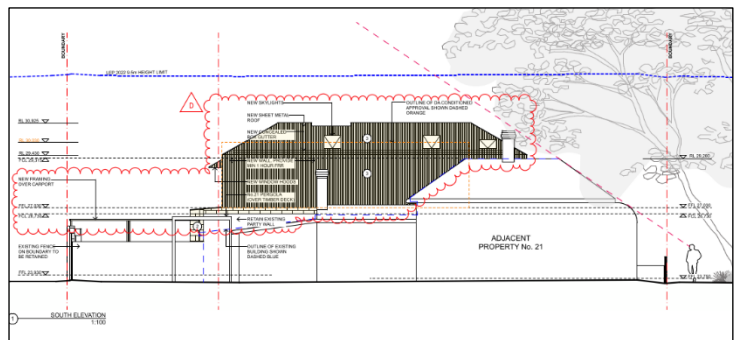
Elevation provided by applicant (facing no. 21 Northwood St)
